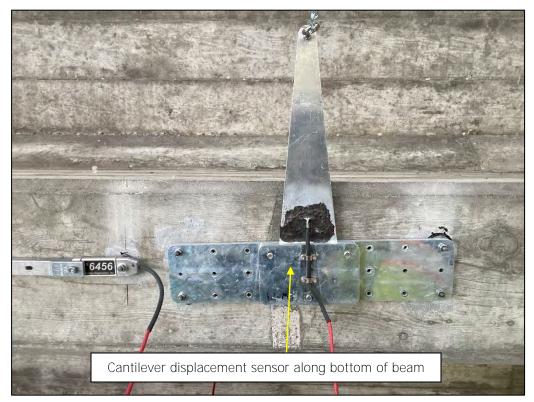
Displacement sensor along WA approach concrete span beams near midspan (typical)
